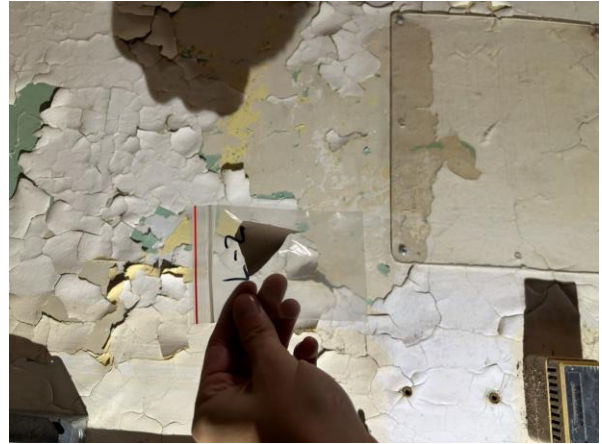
Sample L-2 – White Lead-based Paint on Plaster Ceiling in Oak Hall 3rd Floor South Stair Landing.
